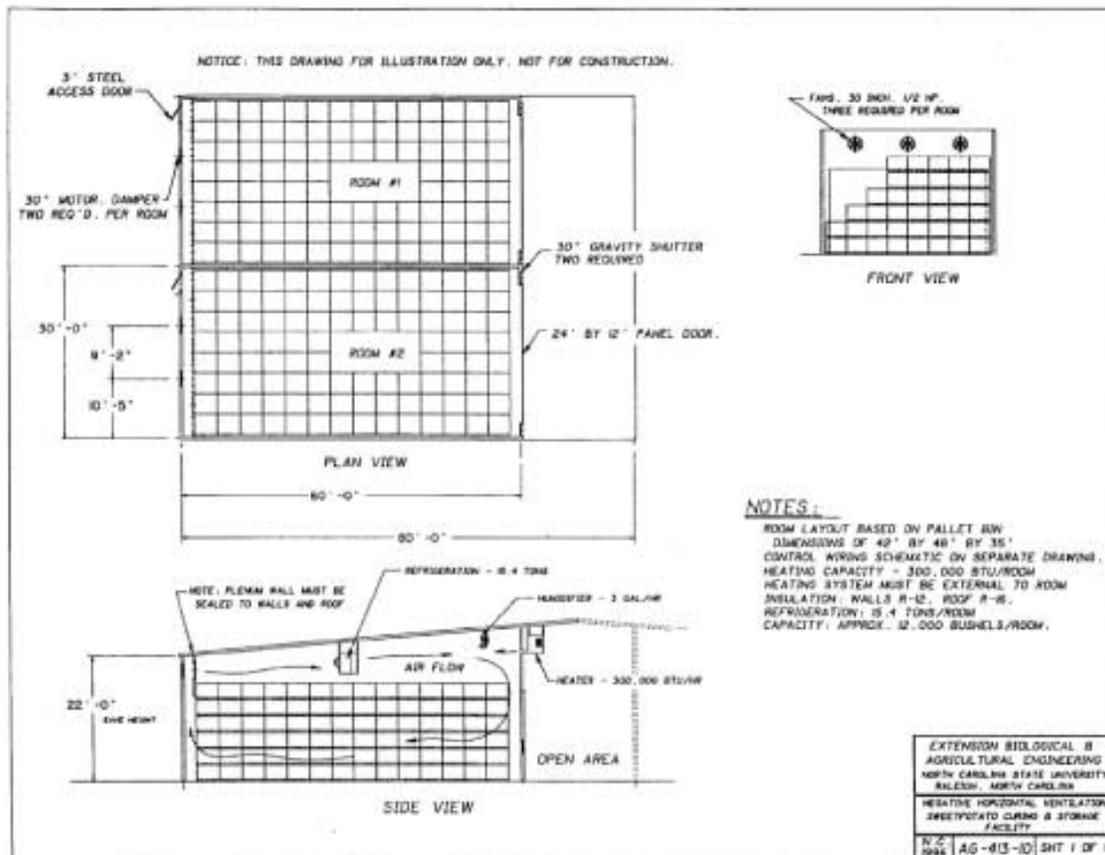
Construction diagram for negative horizontal ventilation storage facility. ILLUSTRATION BY M. DENTON
